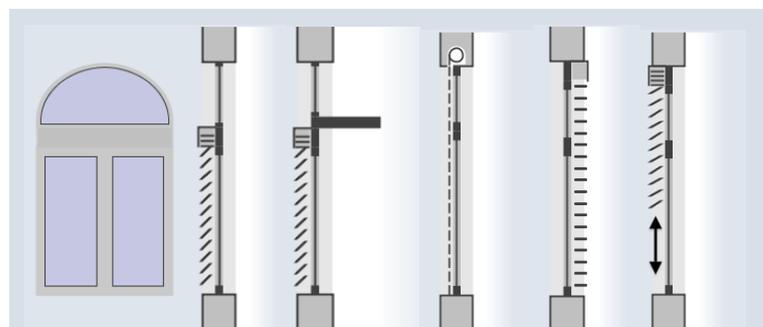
The window definition allows multiple and dynamic systems for shading, daylighting, glare protection and ventilation
